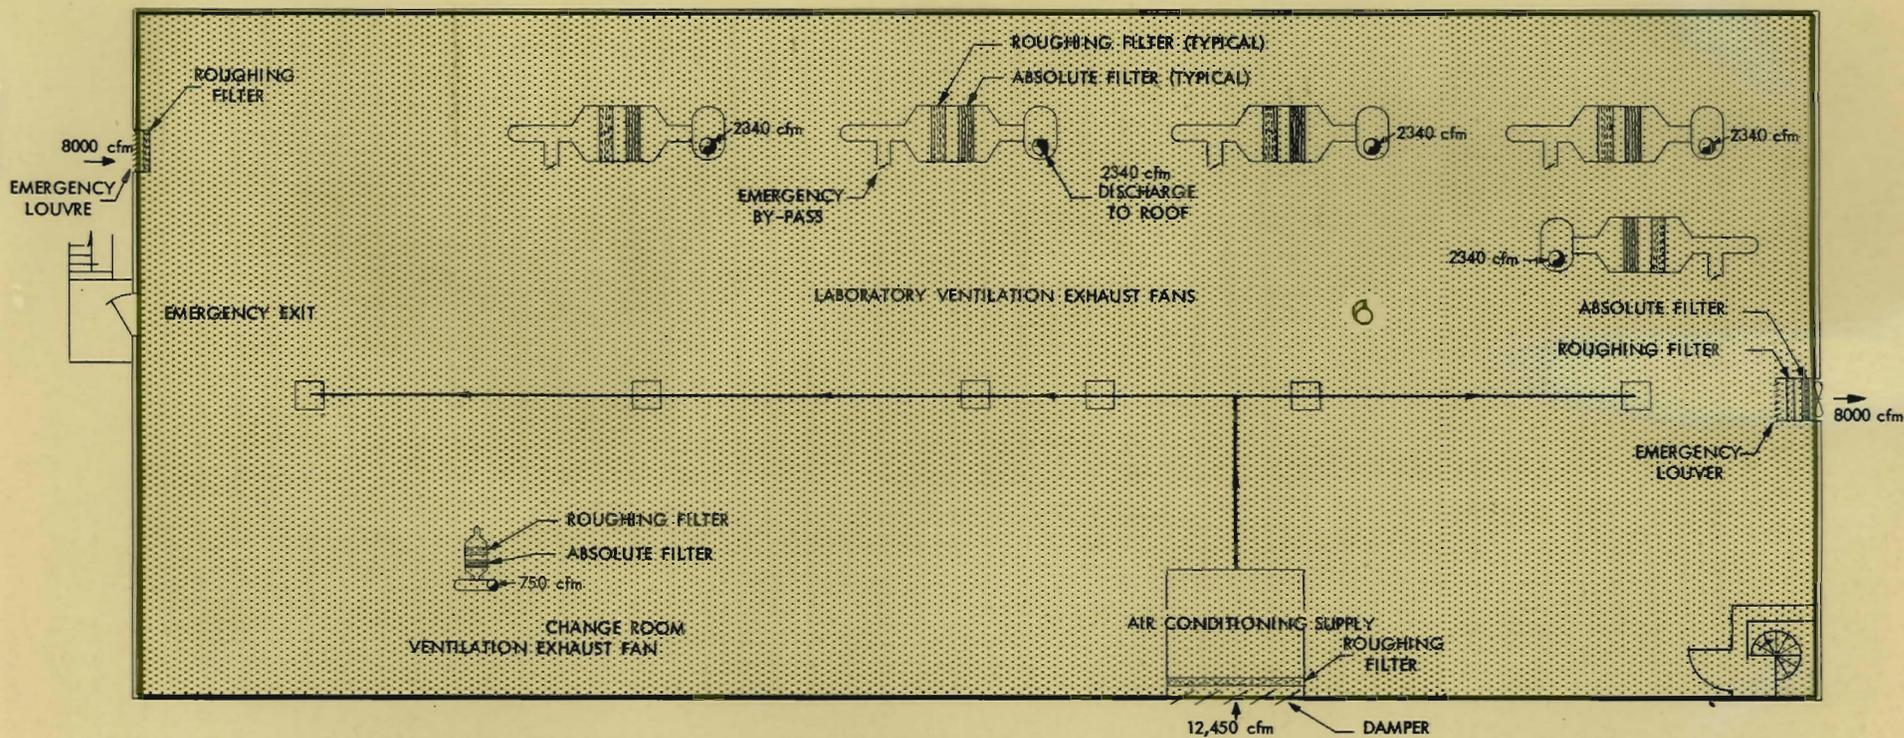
BUILDING 3508 SECOND FLOOR PLAN
